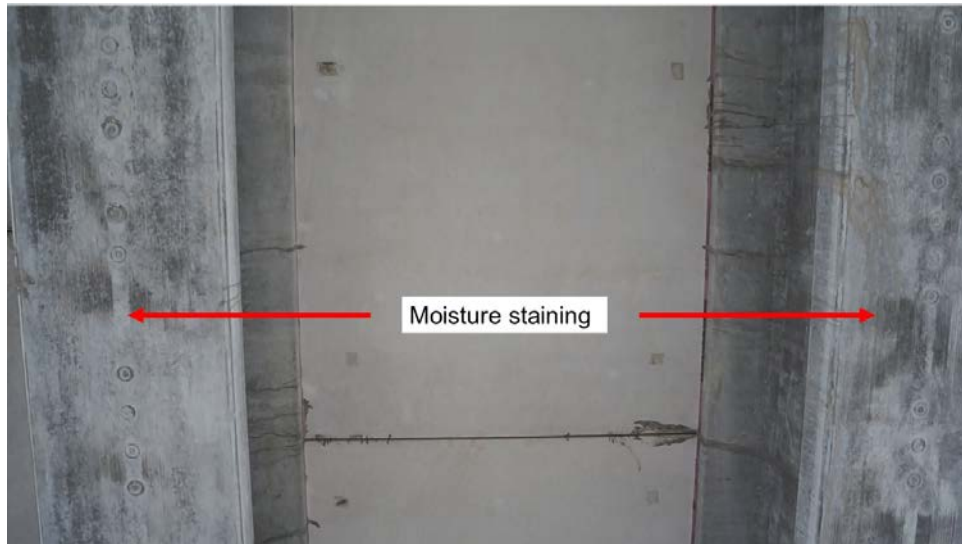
Moisture Staining Underneath the Bridge Beams
